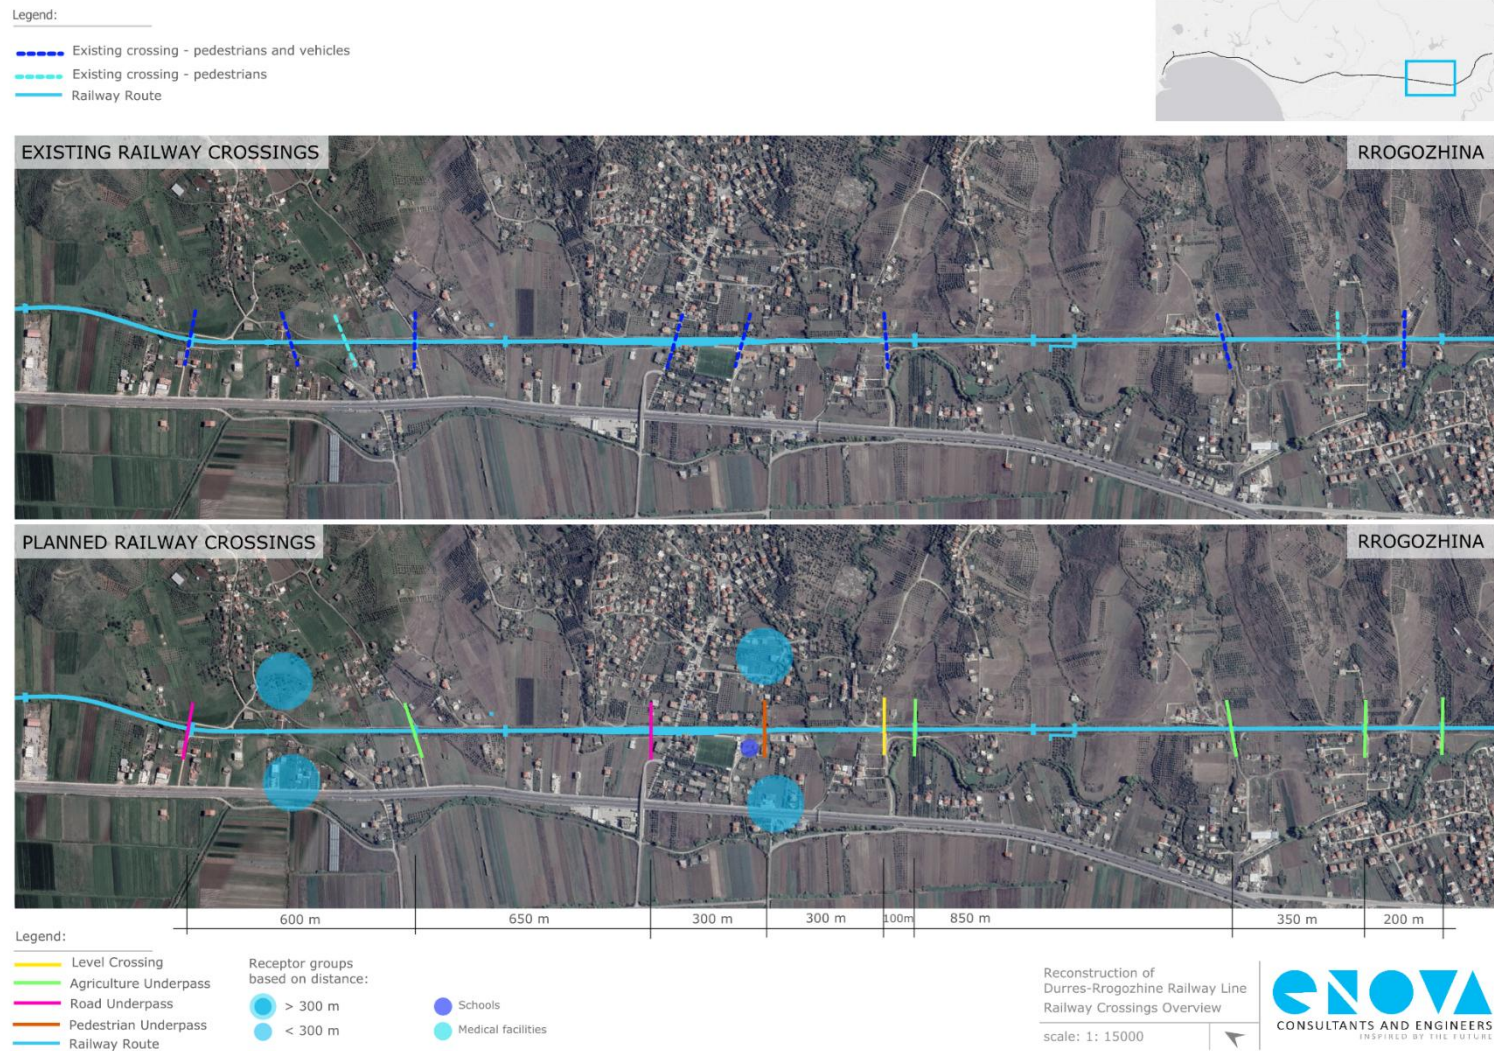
Existing and planned railway crossings in Rrogozhina area (part 1)
